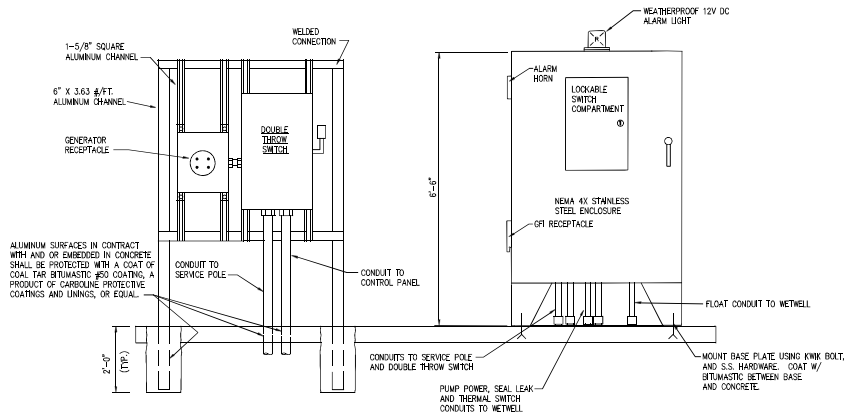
DETAIL - SLAB FOR RECEPTACLE, DT SWITCH, AND PUMP CONTROL PANEL
